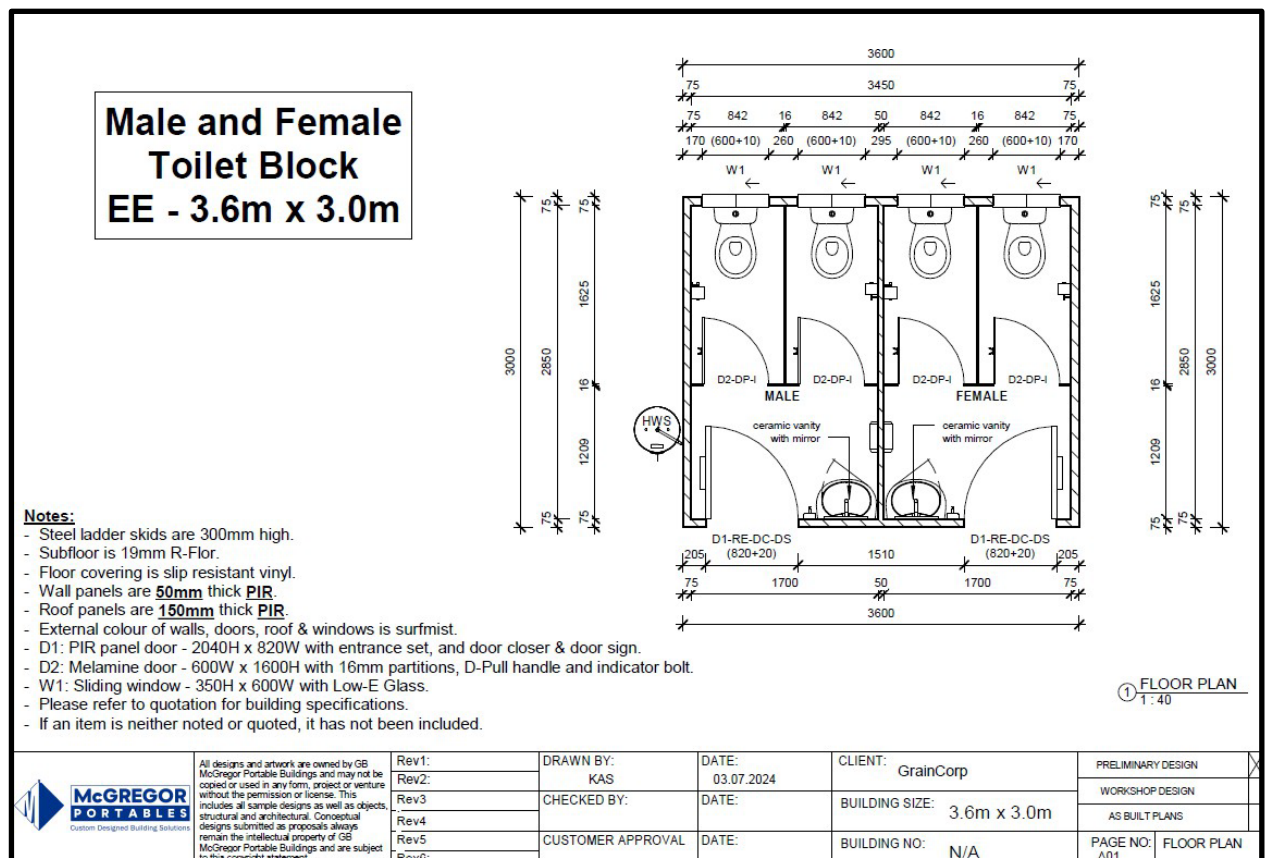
Proposed Floor Plan (Source: McGregor Portables)
